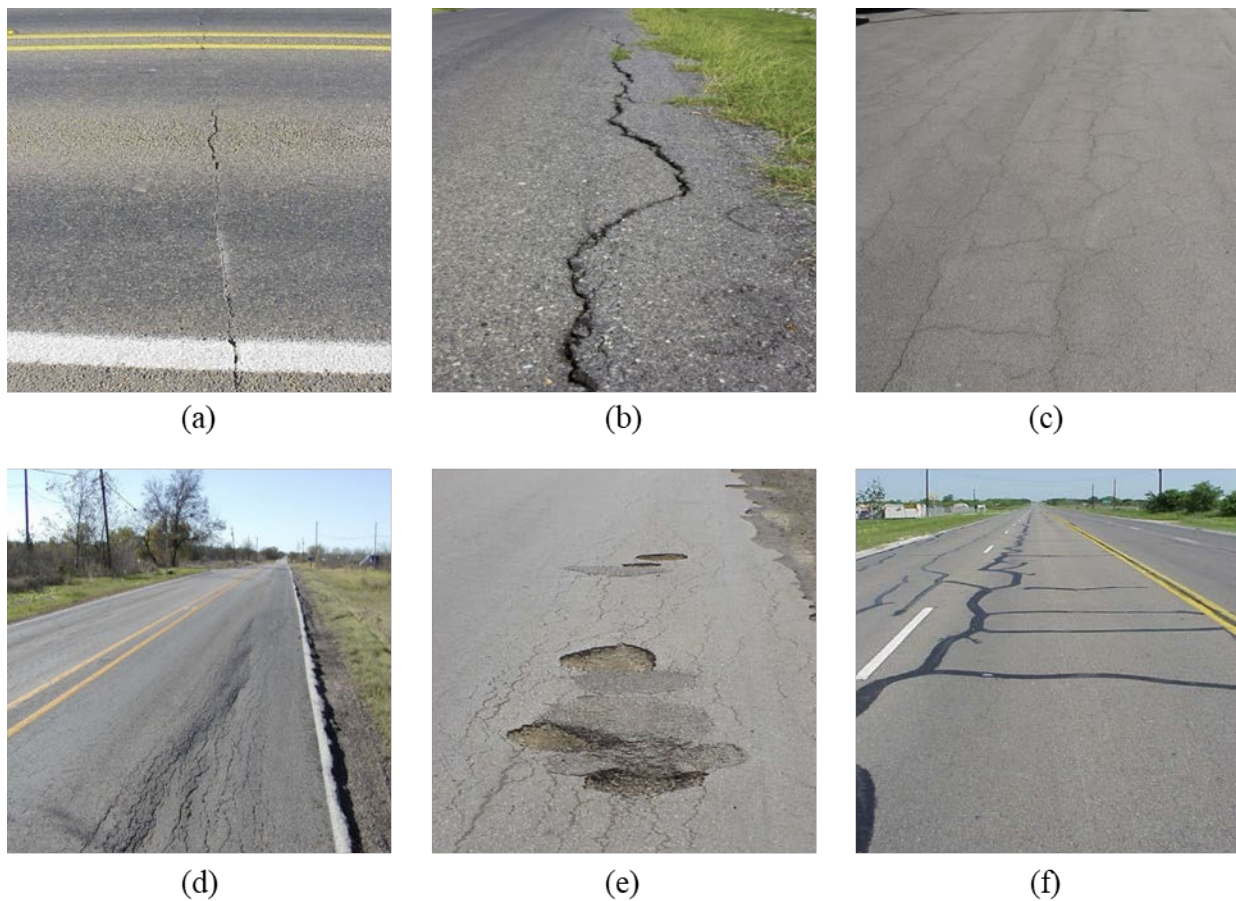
Distresses on flexible pavement: (a) Transverse crack; (b) Longitudinal crack; (c) Block cracking; (d) Alligator cracking; (e) Failures; (f) Sealed transverse and longitudinal cracks. Modified after TxDOT Pavement Rater's Manual 2021 (*Pavement management information system, rater's manual fiscal year 2021, 2020*)
